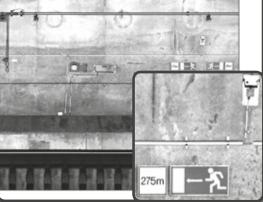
Detail of side wall with recognition of track, sidewalk, installation and signs
